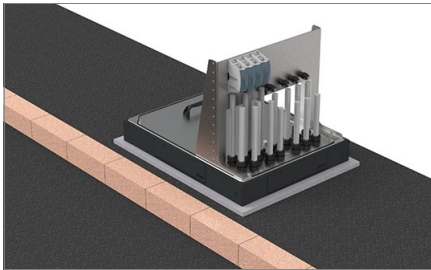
Cut the AC/DC installation cable to length and fit the appropriate compression cable lugs and wire end ferrules.
